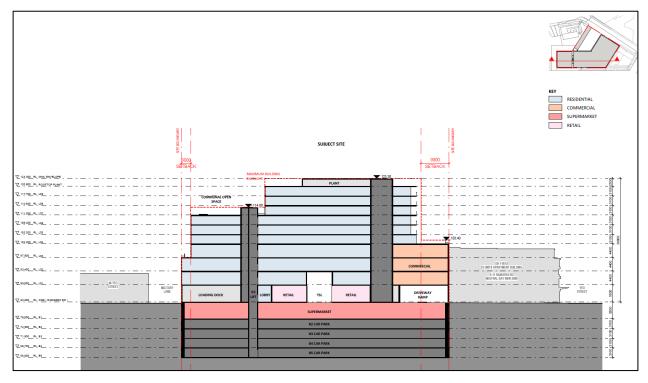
Proposed Yeo Street section (source: KTA architectural plans)
